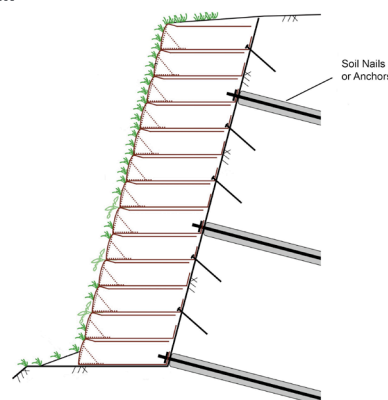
PYRAWALL as vegetated facing for a steep anchored slope
